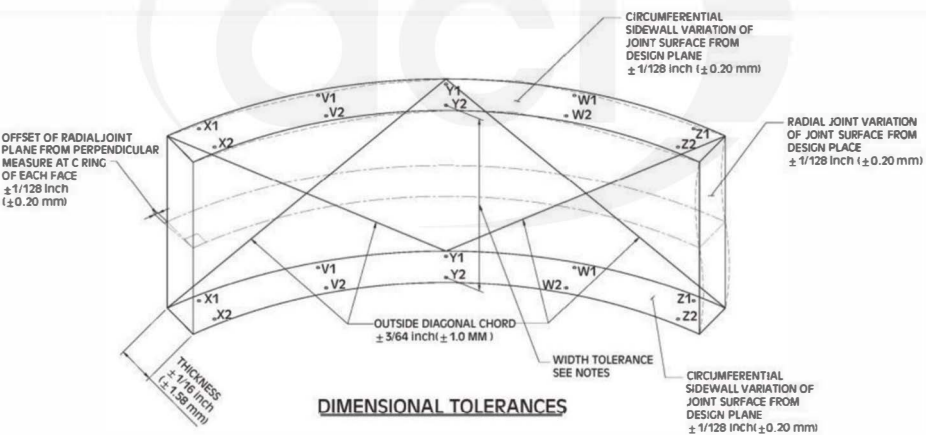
Alternative tolerance measurement method for formwork dimension control.
